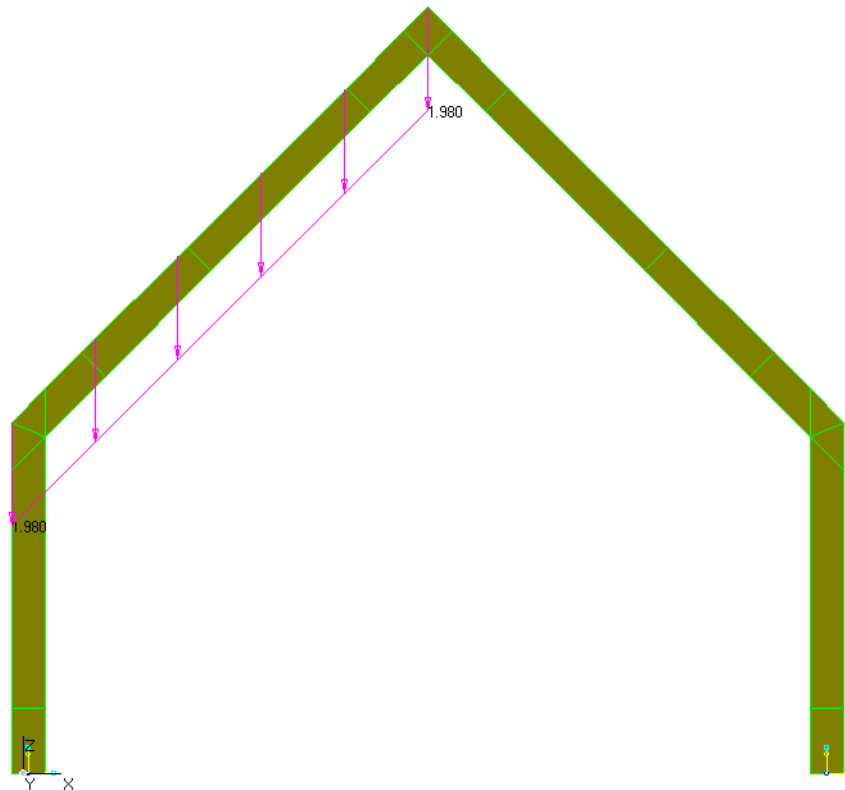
Gable roof building. The design snow load on the left acting in the direction of the Z-axis, kN/m^2
